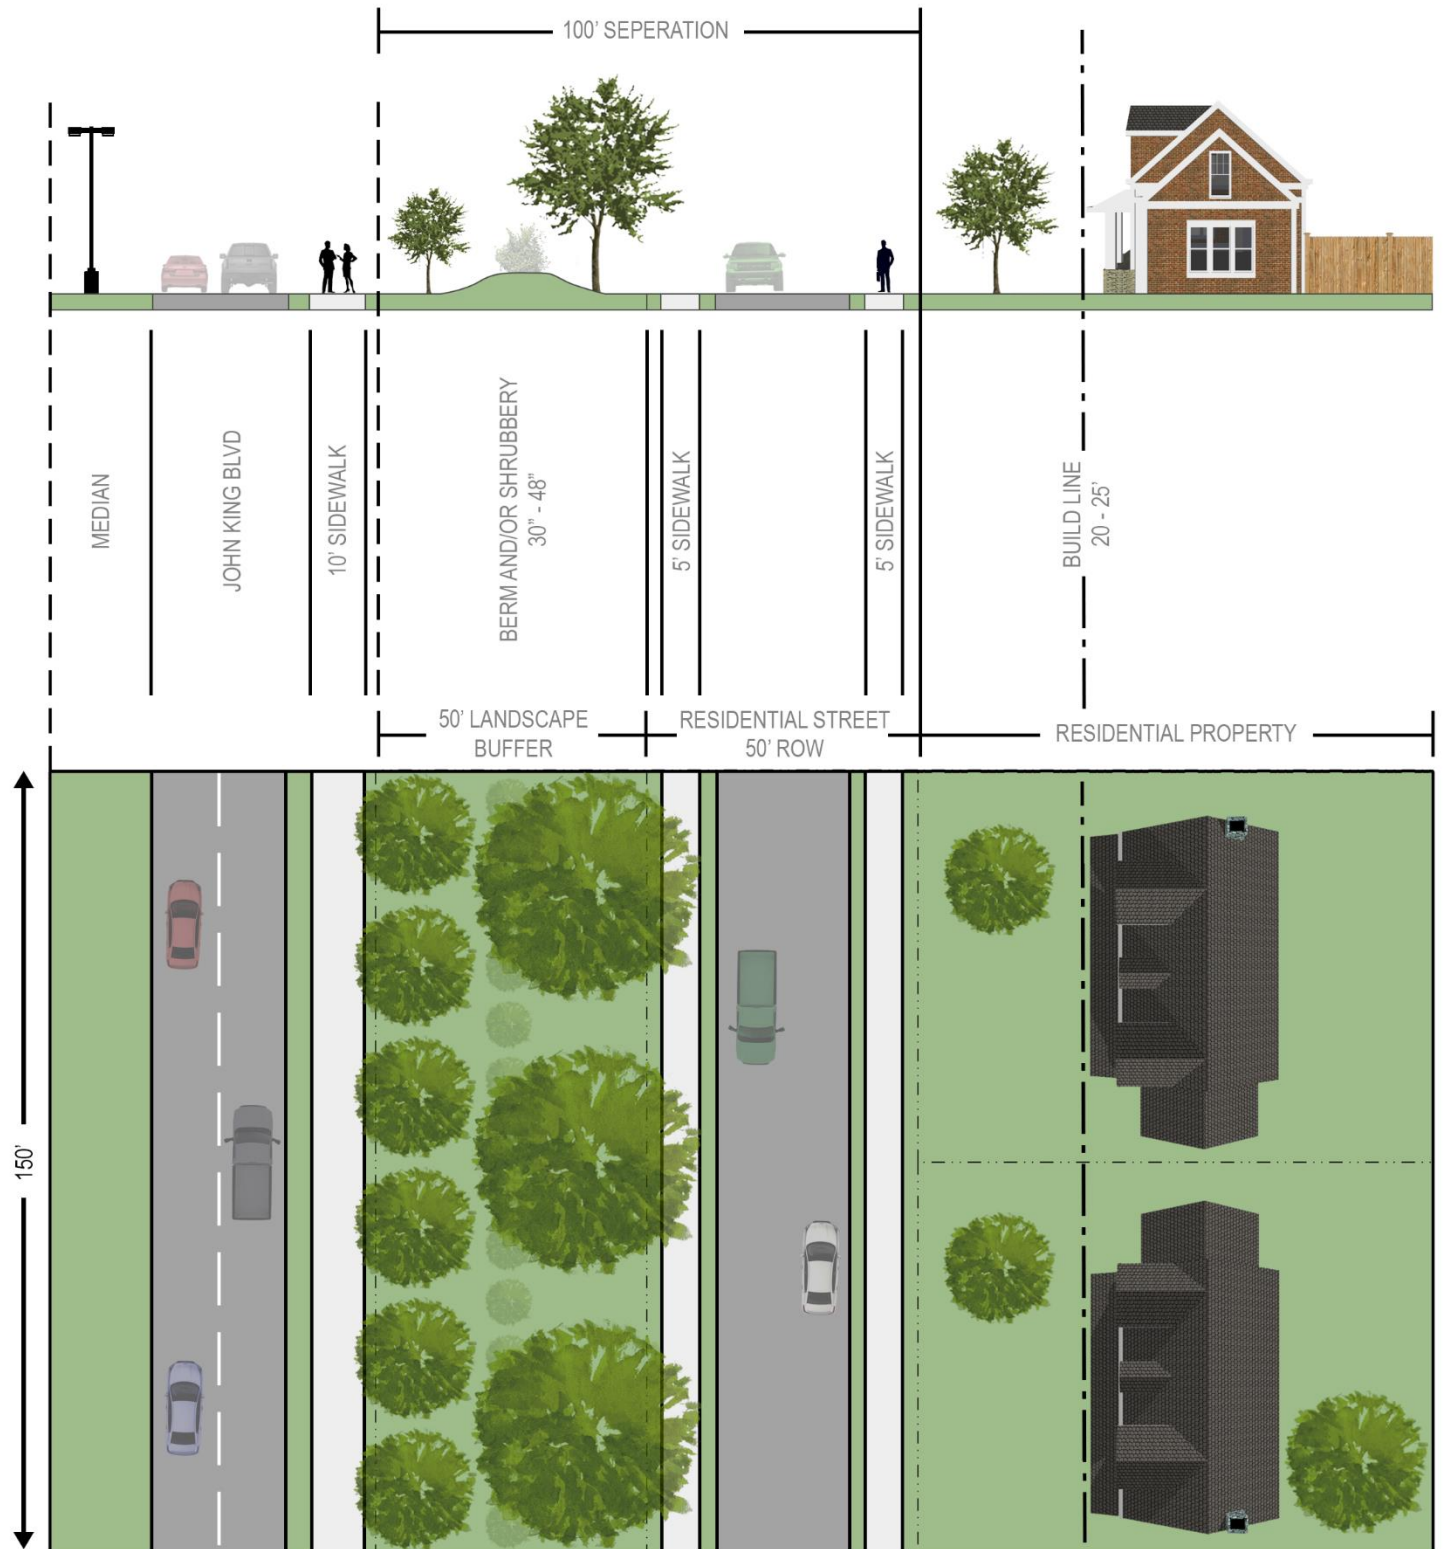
DESIGN ALTERNATIVE #4; SLIP STREET
